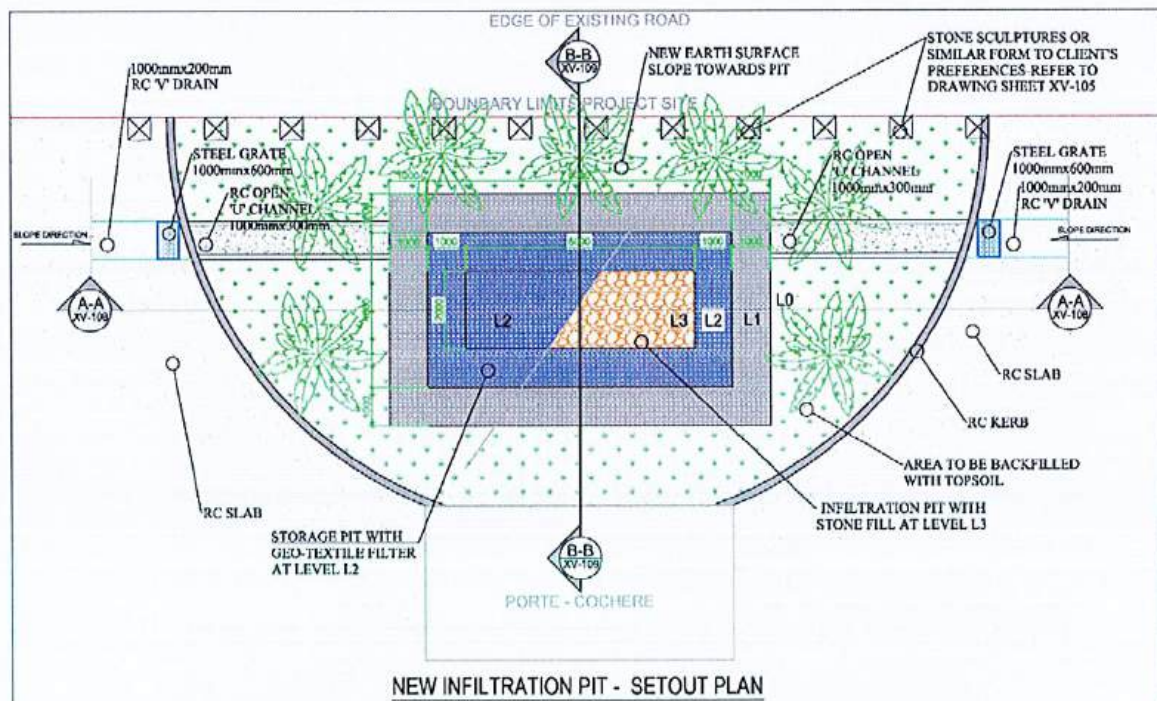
Typical Drainage structure plan (infiltration pit) in front of the building
